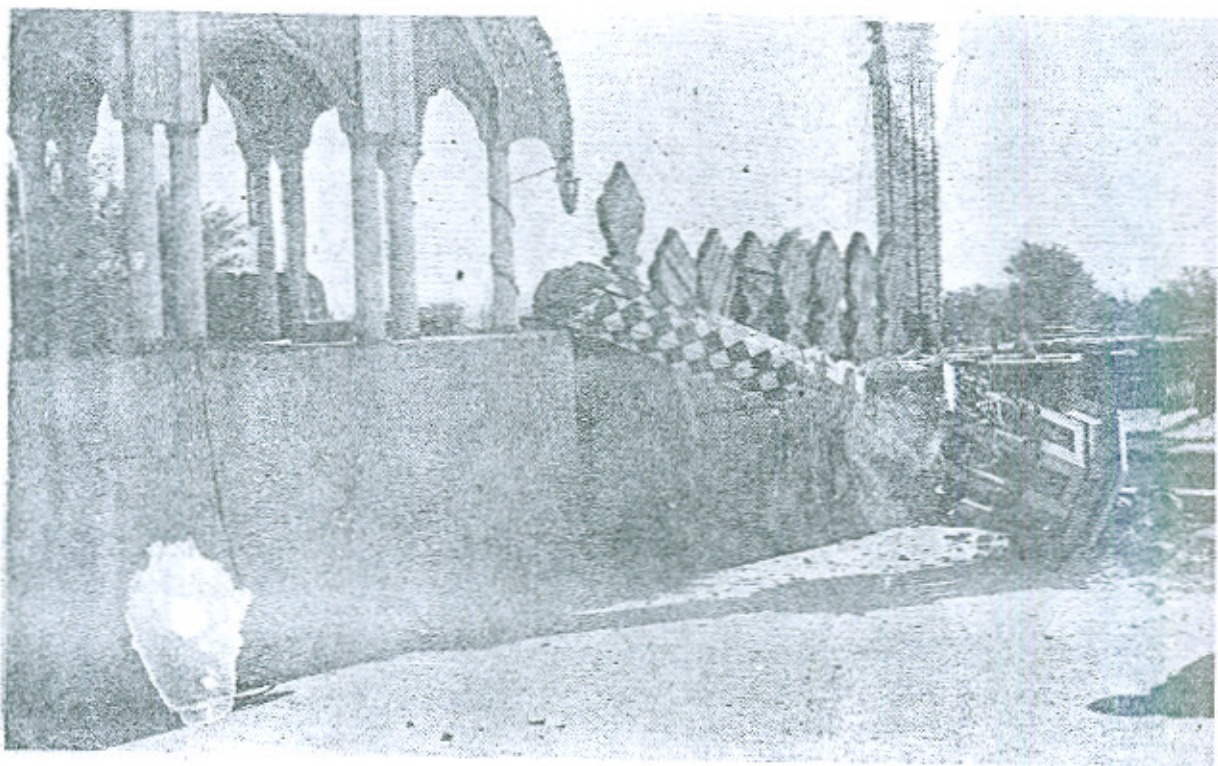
Extensively damaged part of Kuri School being demolished.
